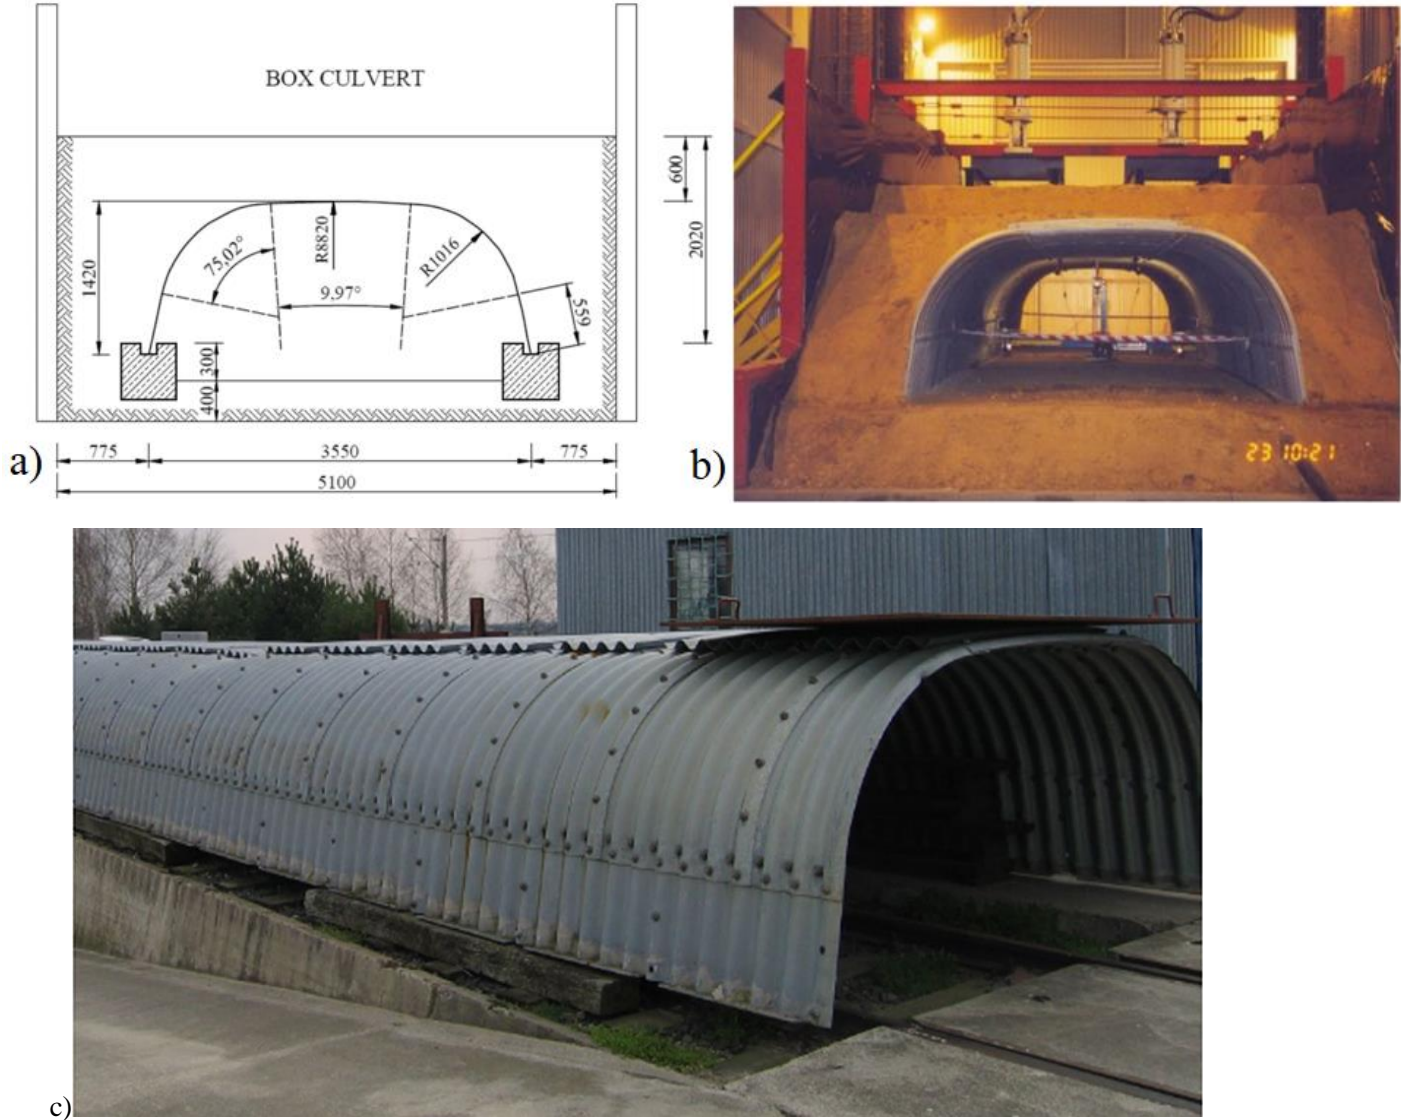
a) Cross-section of the tested structure b) after soil backfill c) general view of the tested structure [98]
